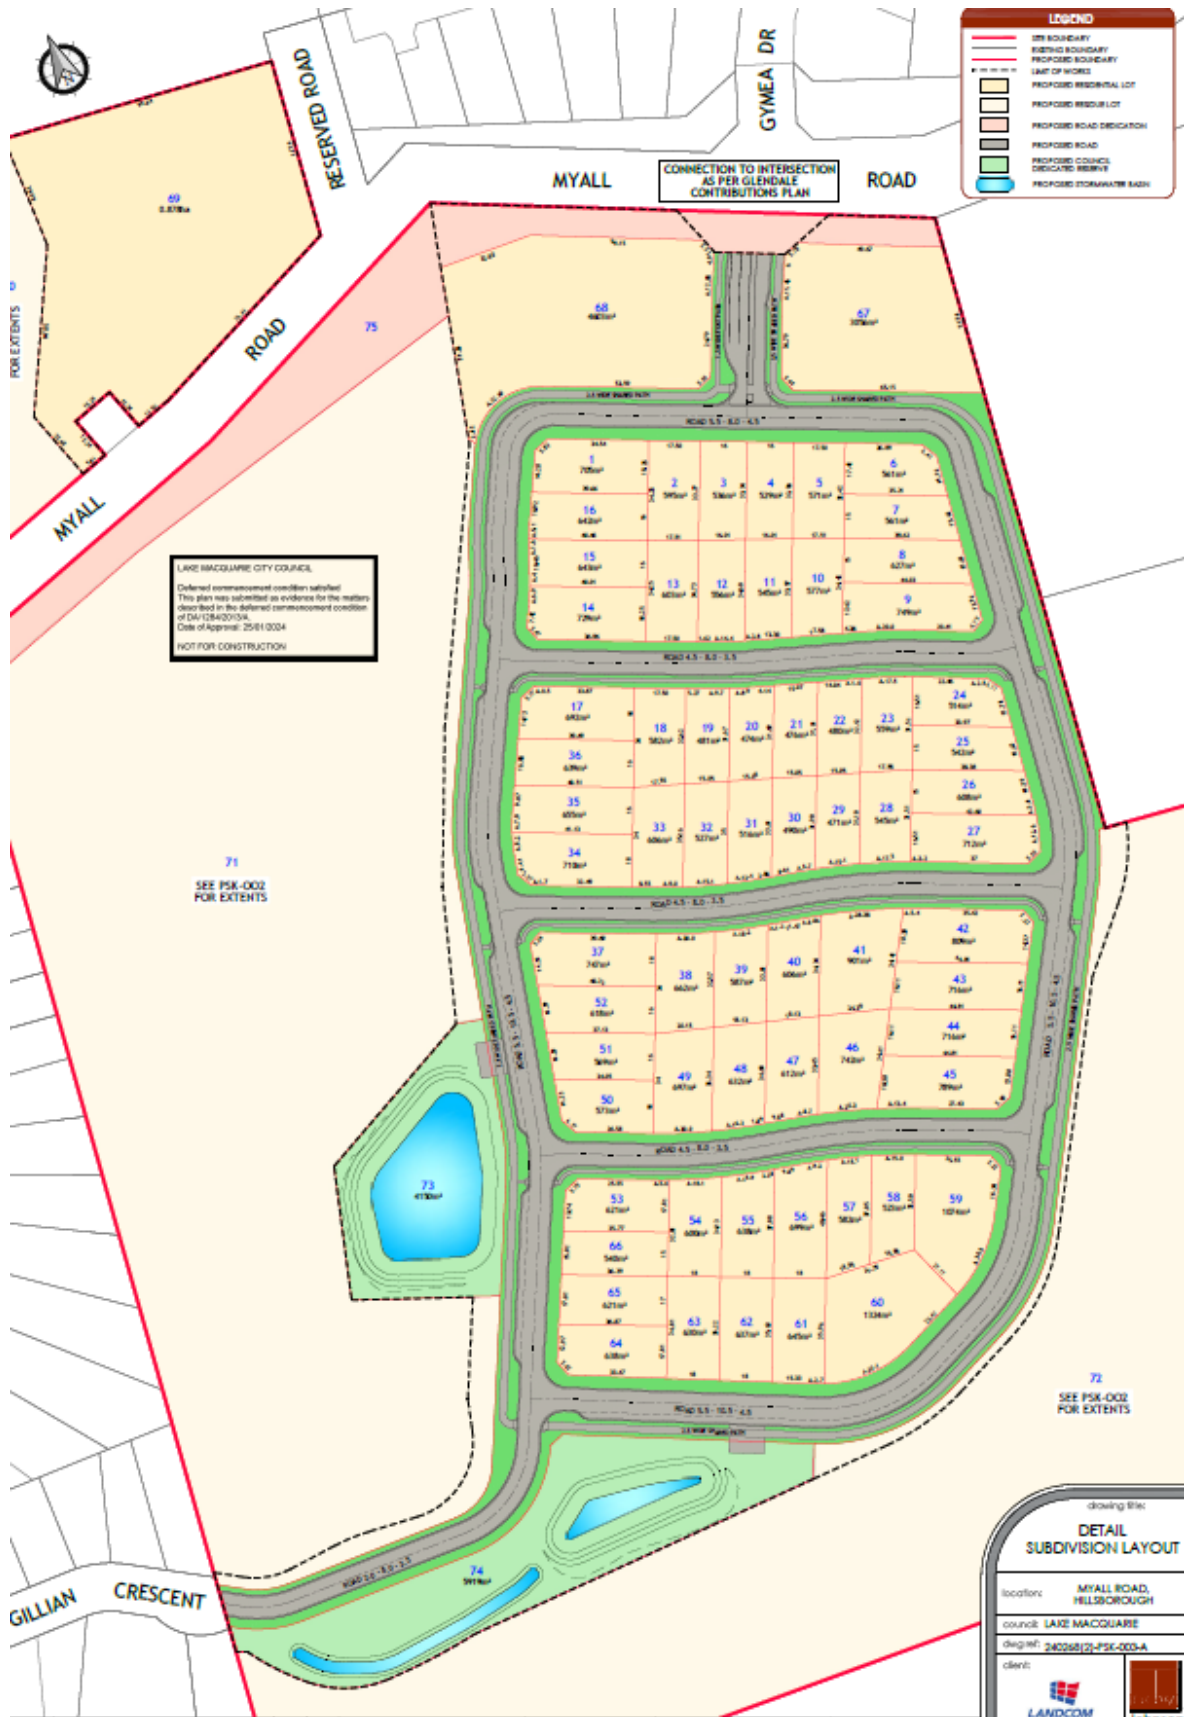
Extract of Detail Subdivision Layout (Source: ADW Johnson, 2023)
